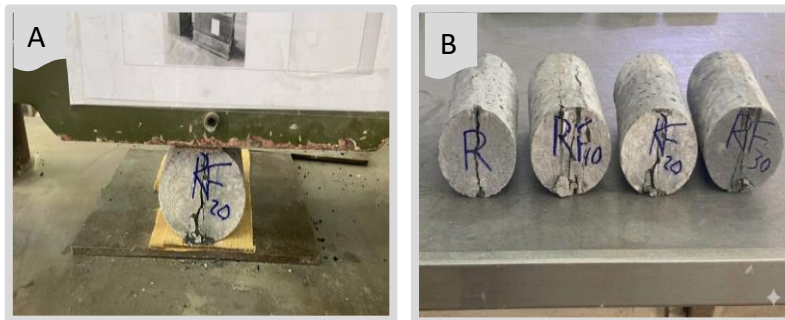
Splitting tensile test (A) testing machine and (B) failed specimens
